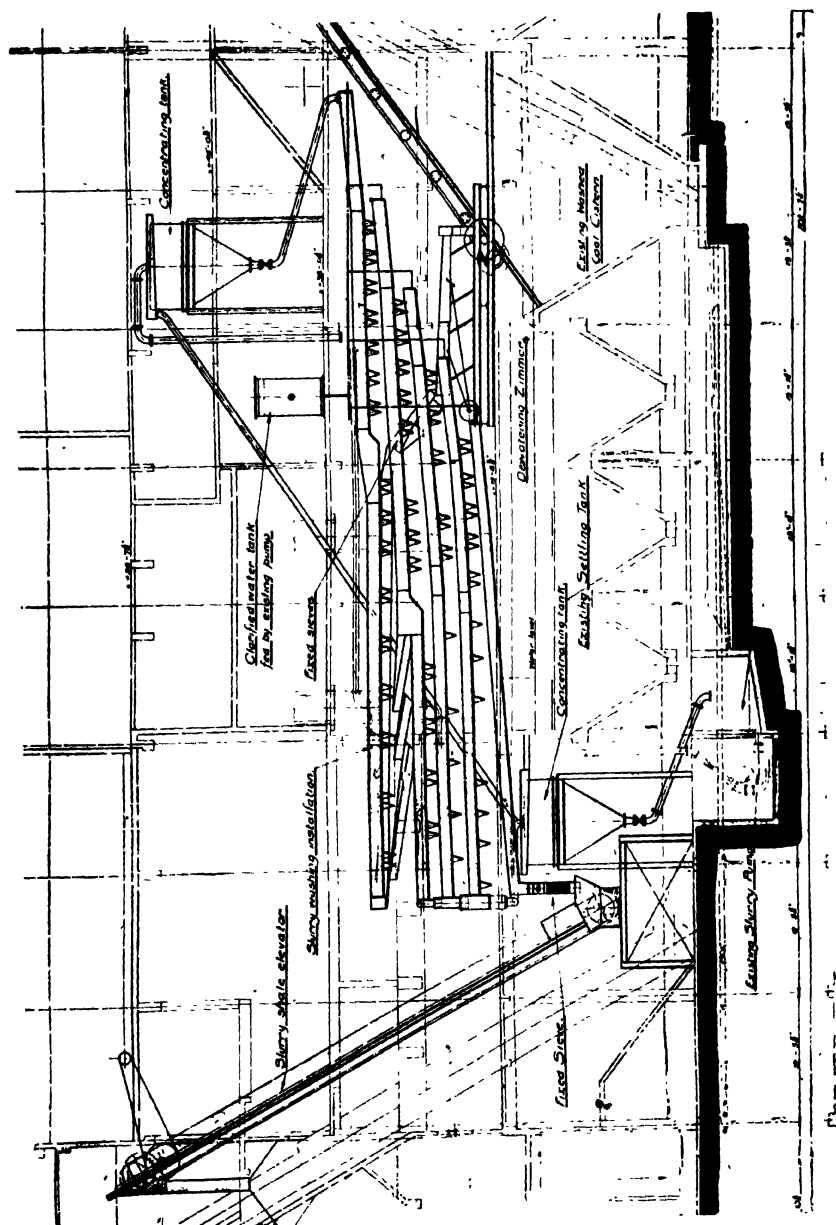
FIG. III.—Elevation of Rheolaveur Slurry Washer.
